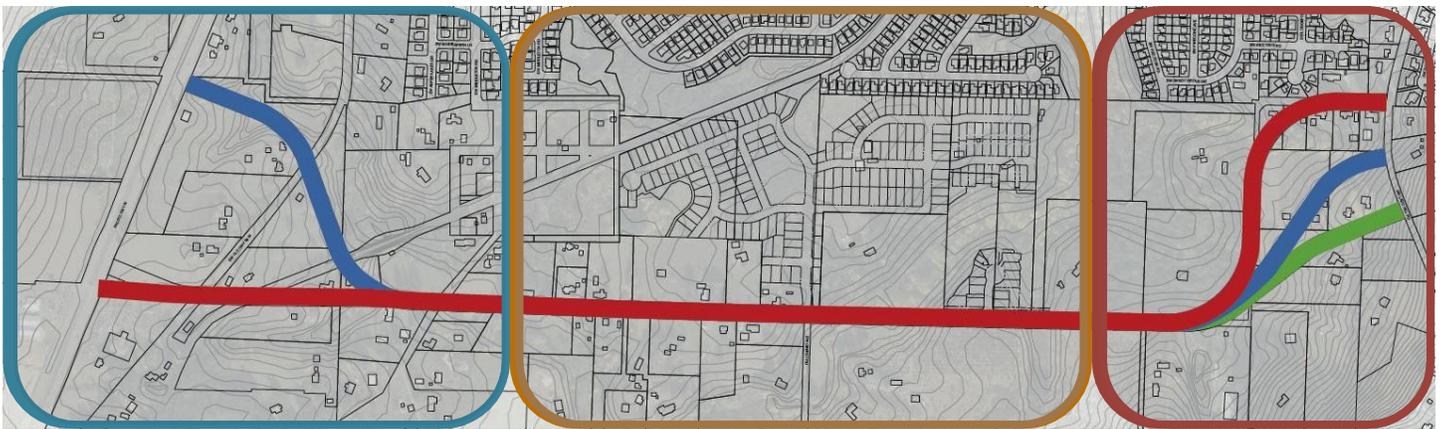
Brookman Concept Plan Subareas and Alignment Options Considered
